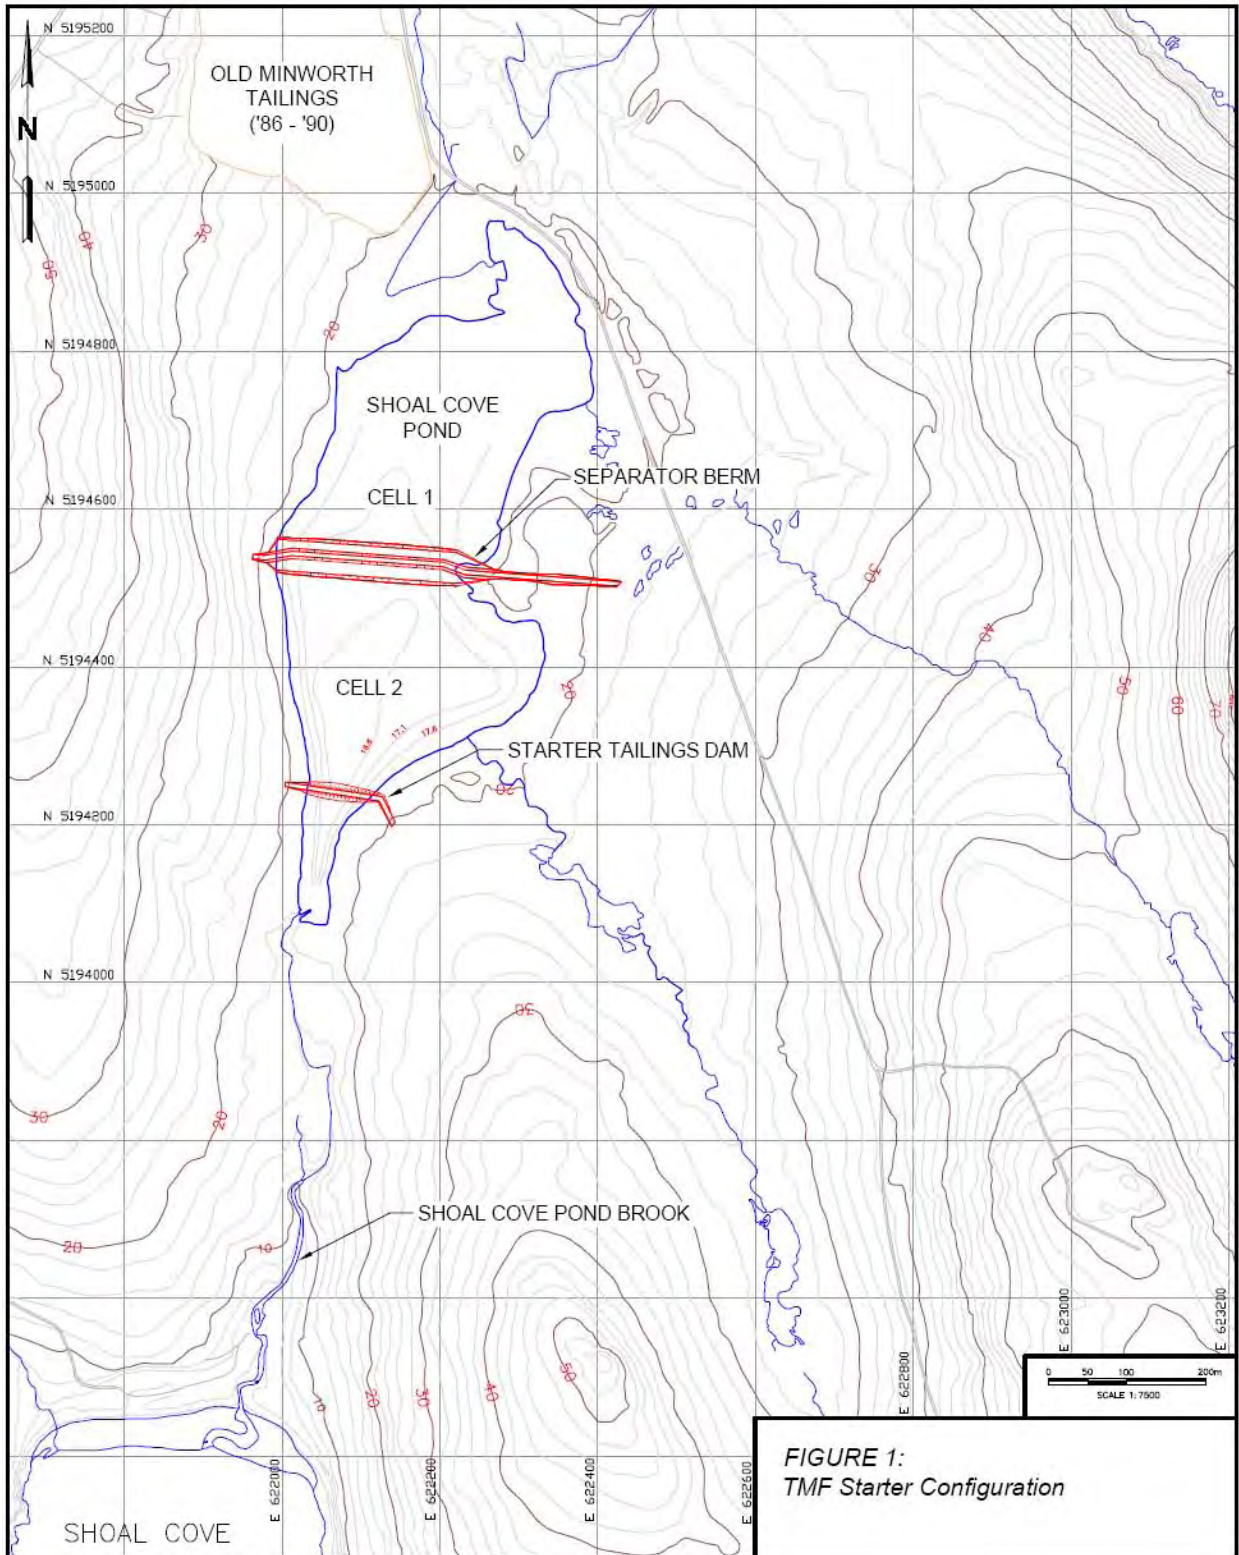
Shoal Cove Tailings Management Facility Layout
